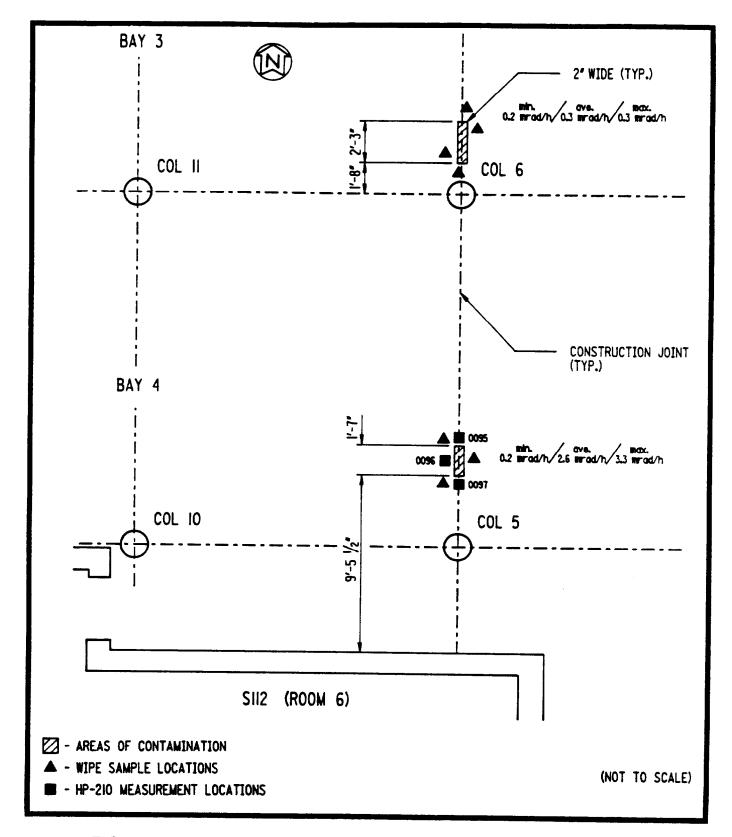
AREAS OF CONTAMINATION — BAYS 3 AND 4 (ROOM 1, FIRST FLOOR)
